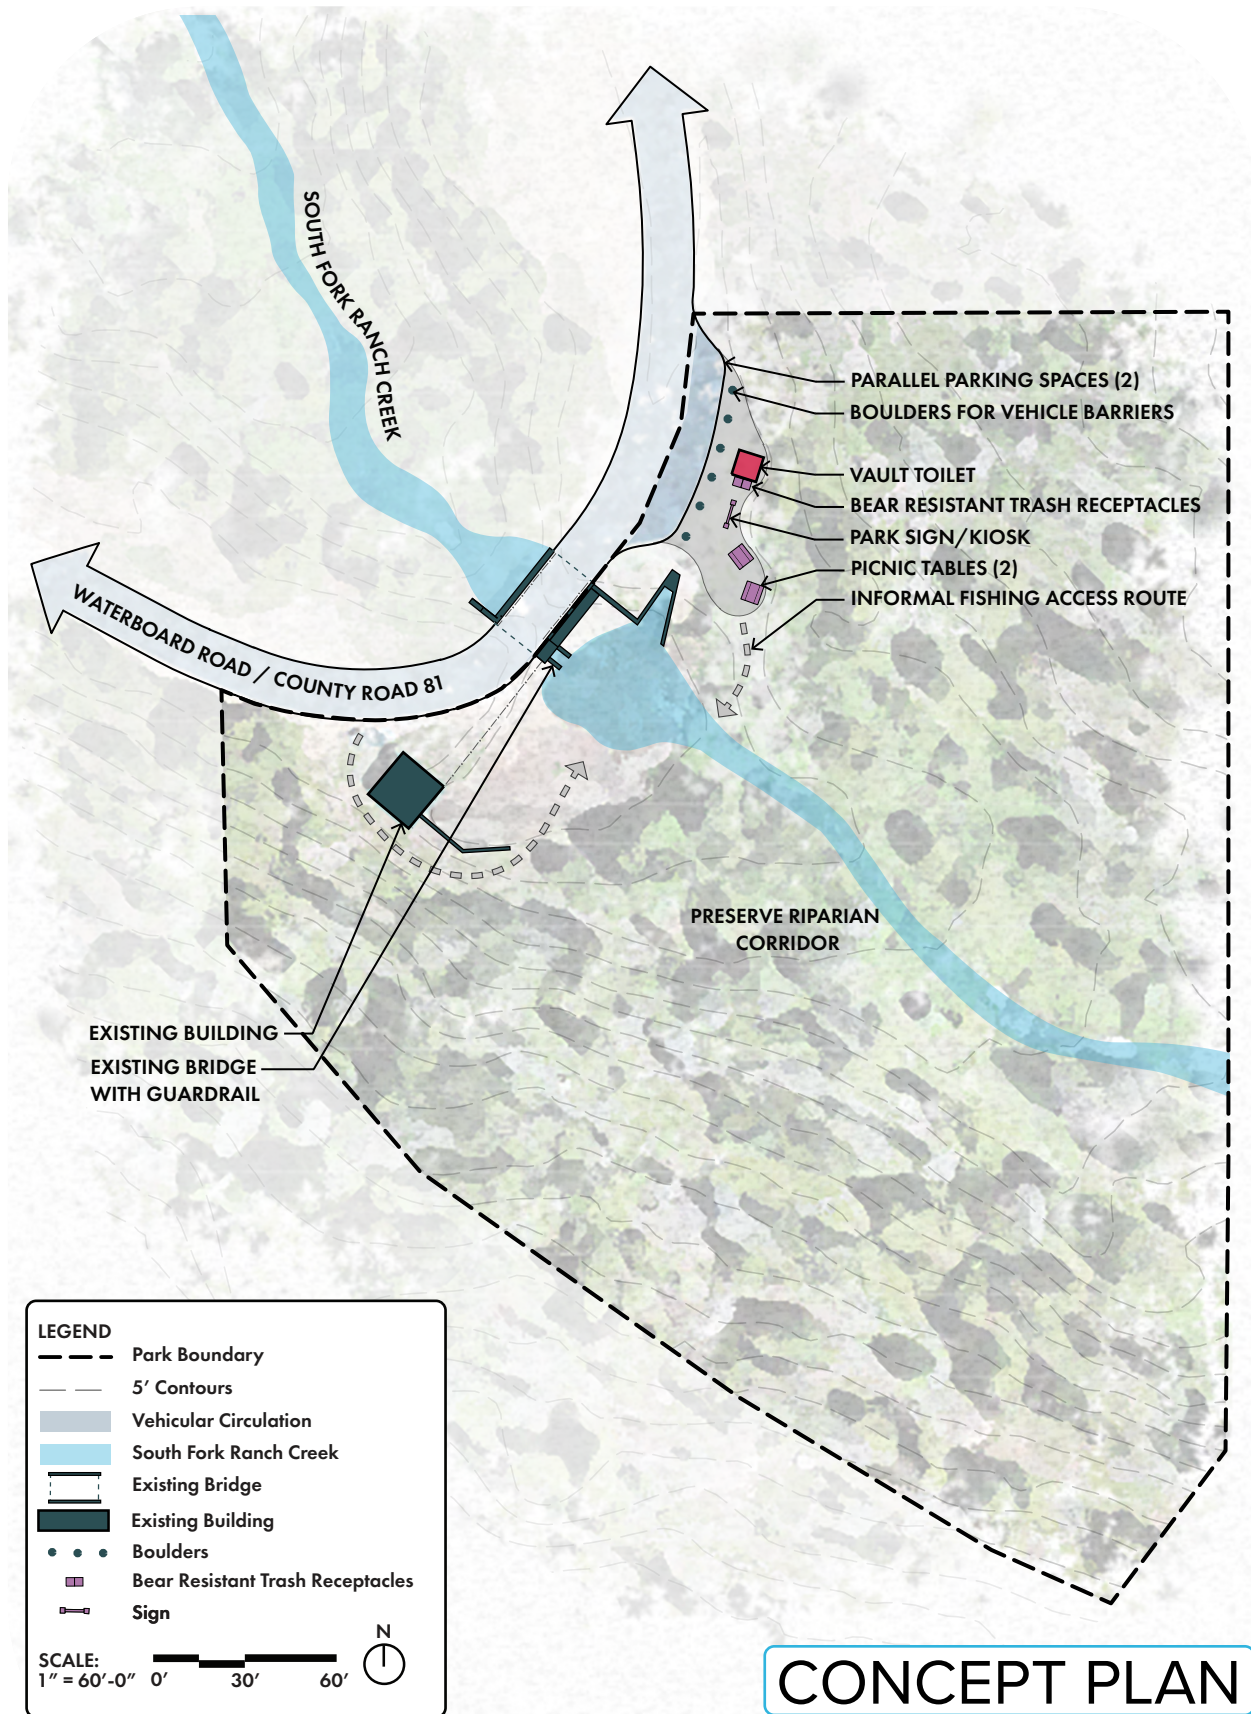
Concept Plan for Ranch Creek Park Note: floodplain and wetland data were not incorporated into this concept design and will need to be studied further before development is approved.
